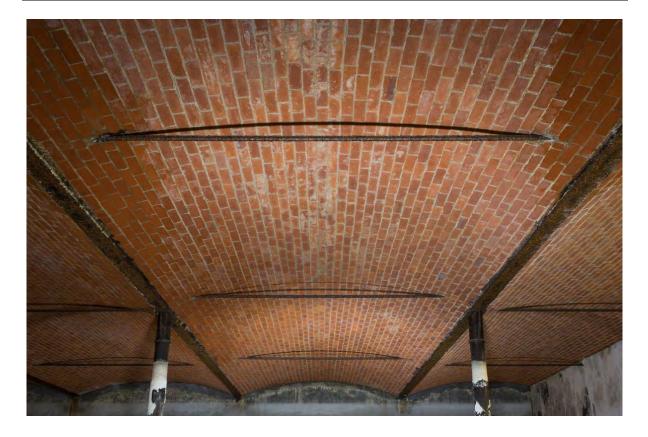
View to the north-west of brick construction barrel vault (showing metal beams, tie beams and supporting columns)
